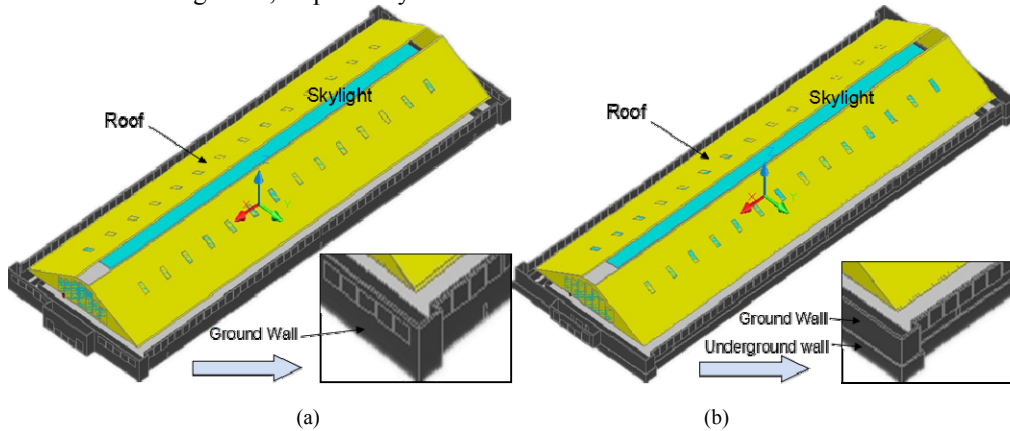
Building models: (a) Model 1: all on the ground; (b) Model 2: semi-underground except pit area
